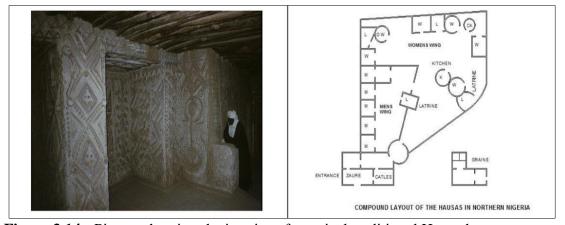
Picture showing the interior of a typical traditional Hausa house entrance and plan built with mud and local materials (Kolo, 2015)
